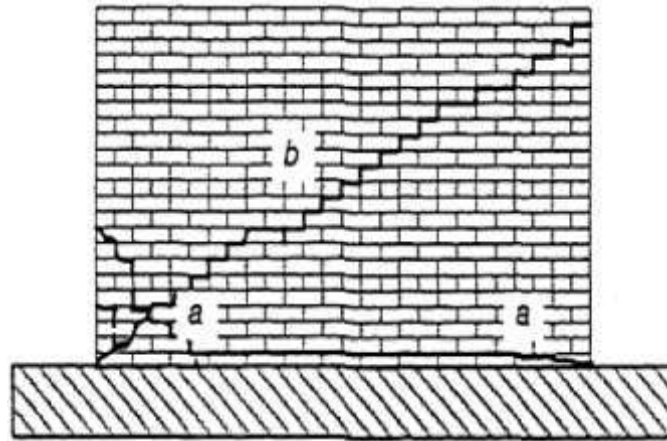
Flexure Crack Pattern for Tested Wall (Abram, 1992)
